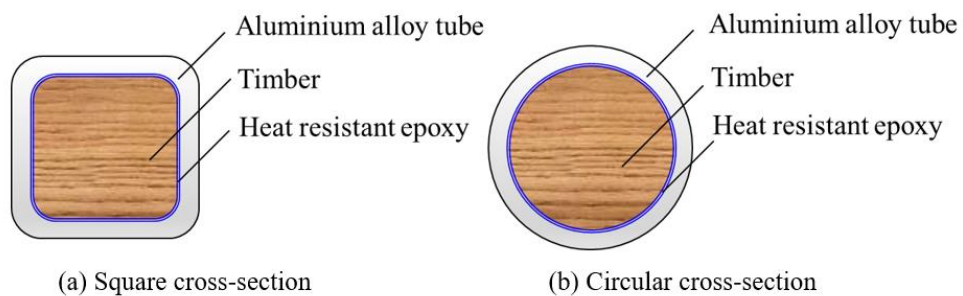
Timber-filled aluminium alloy tubular (TFAAT) cross-sections.
